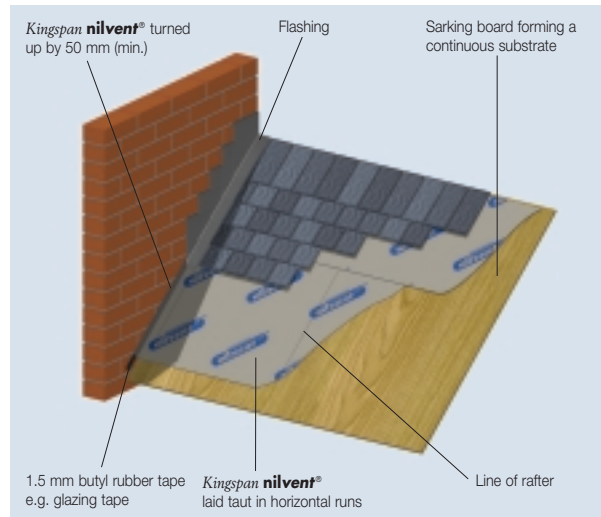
Abutments – Fully Supported Horizontal Installation with Natural Slates
